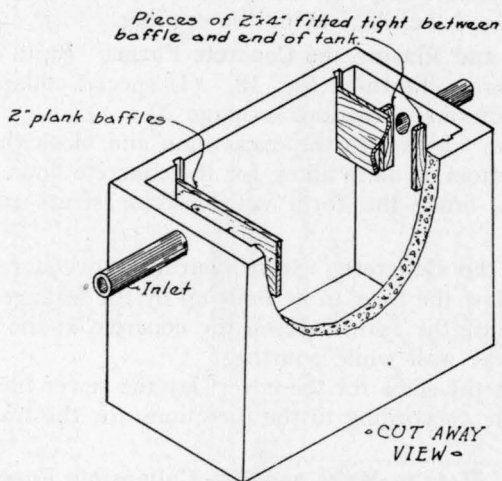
CUT-AWAY VIEW OF A SINGLE-CHAMBER TANK
